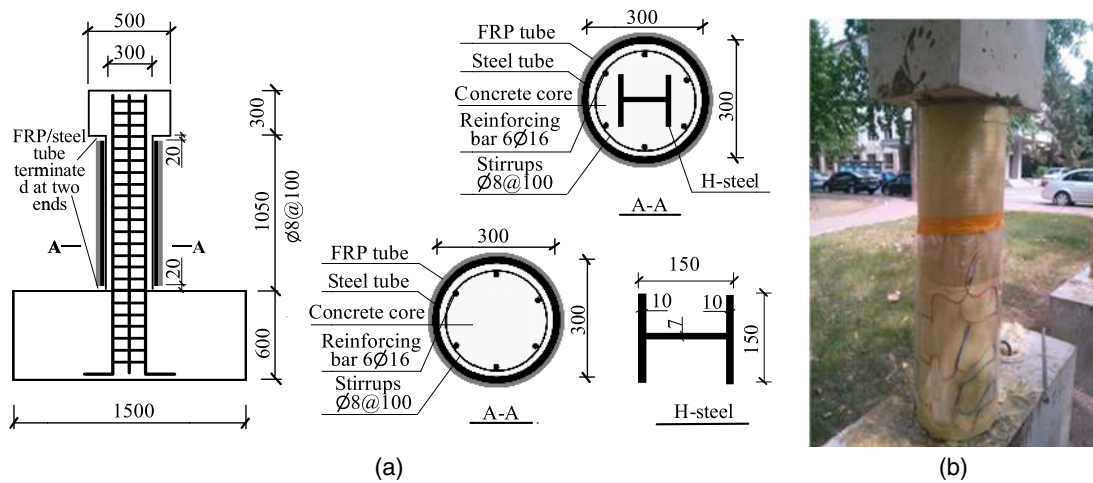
Details of test specimens (units: millimeters): (a) dimension and reinforcement arrangement; and (b) confined columns.
